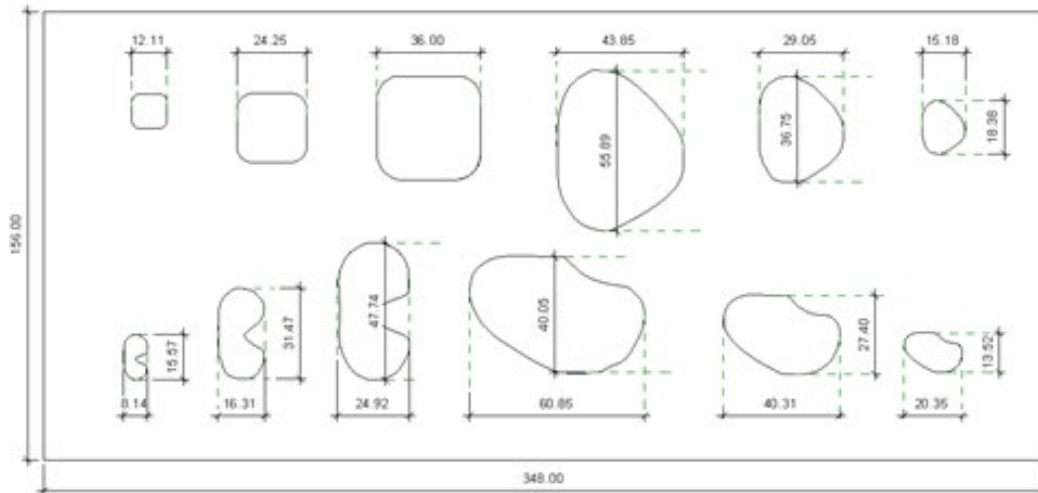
A more complex numerical slab of similar size to a real bridge deck (unit: inch)
